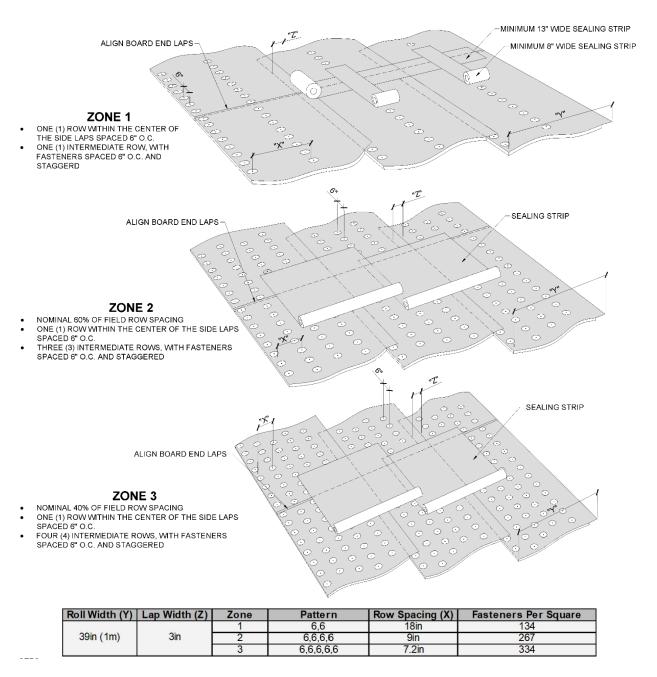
SBS Modified Bitumen Laminated Cover-Board, Mechanically Fastened, 6 in O.C. In Lap and 1 Row in Between Laps at 6 in O.C. Fastening Pattern
